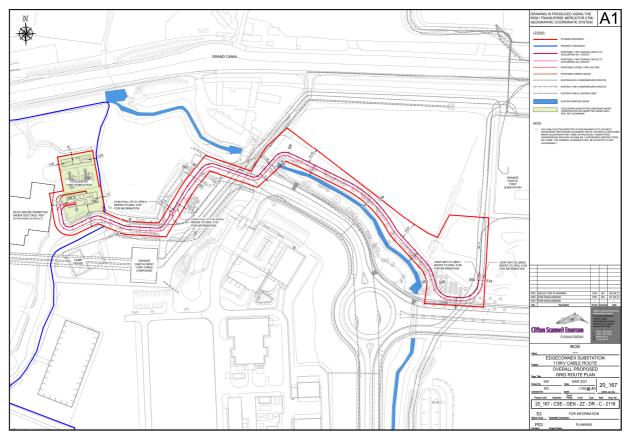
Proposed site layout plan of the Proposed Development site (red line) indicating proposed 110kV transmission lines (purple and pink lines) as well as the permitted development (shaded green) (Source: Drawing no. 20 167-CSE-GEN-ZZ- DR-C-2118, CSEA Consulting Engineers)
